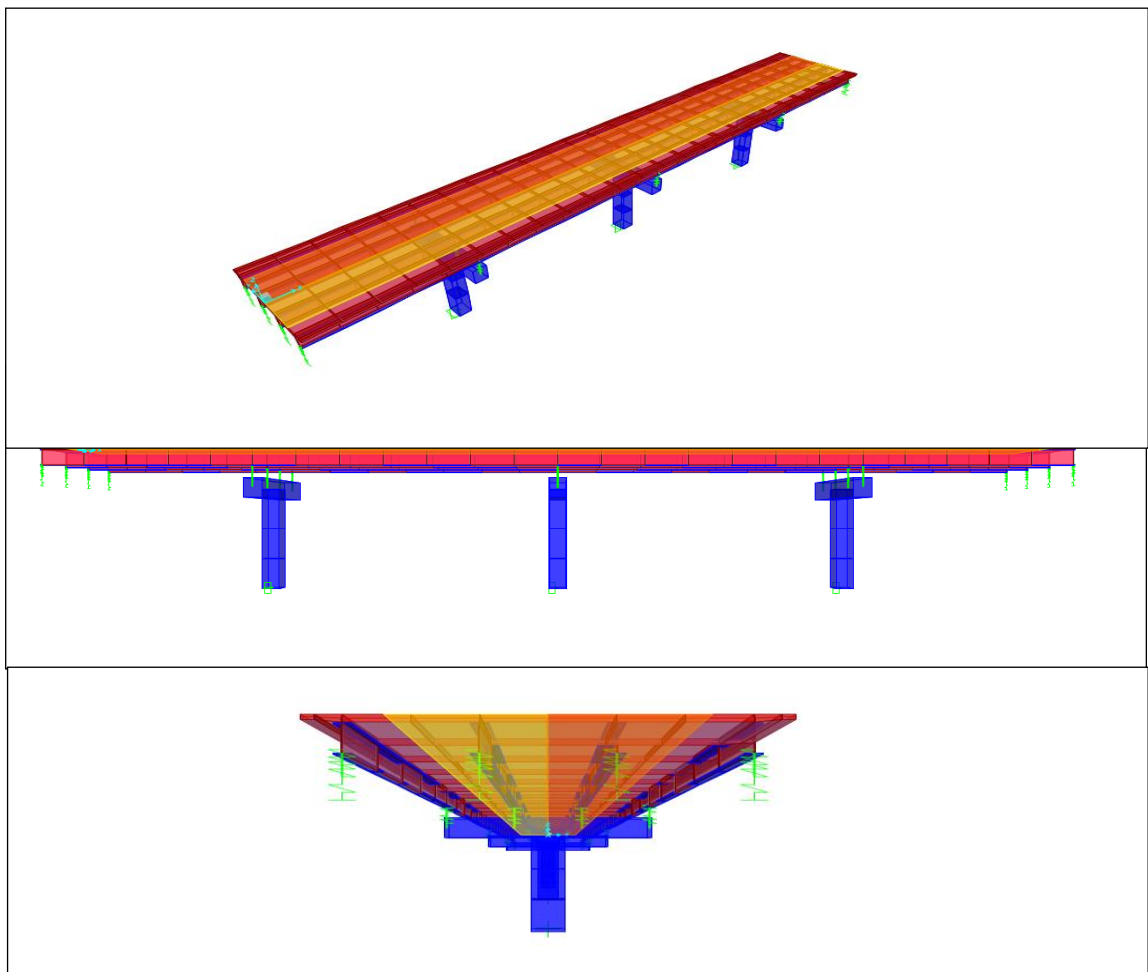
3-D, elevation & cross-section view of the composite bridge (software model)
